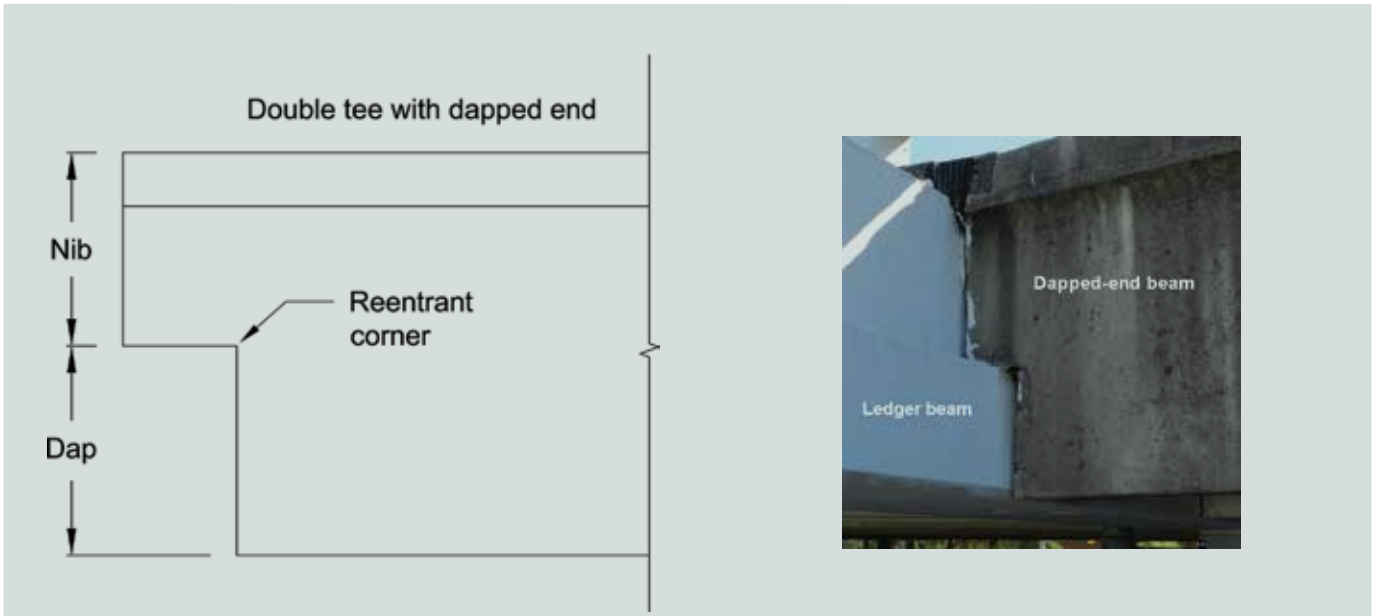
Typical dapped-end beam and dapped-end connection used for parking structures.
